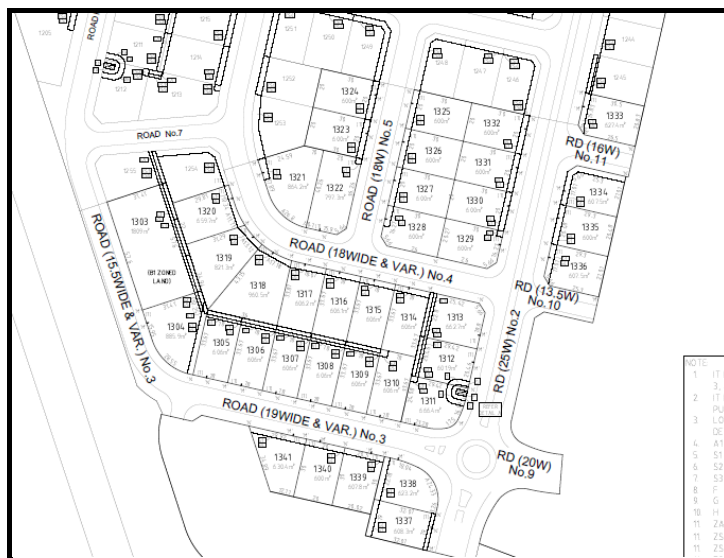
Proposed Stage 1A (Source: JMD, 27/4/2022)
